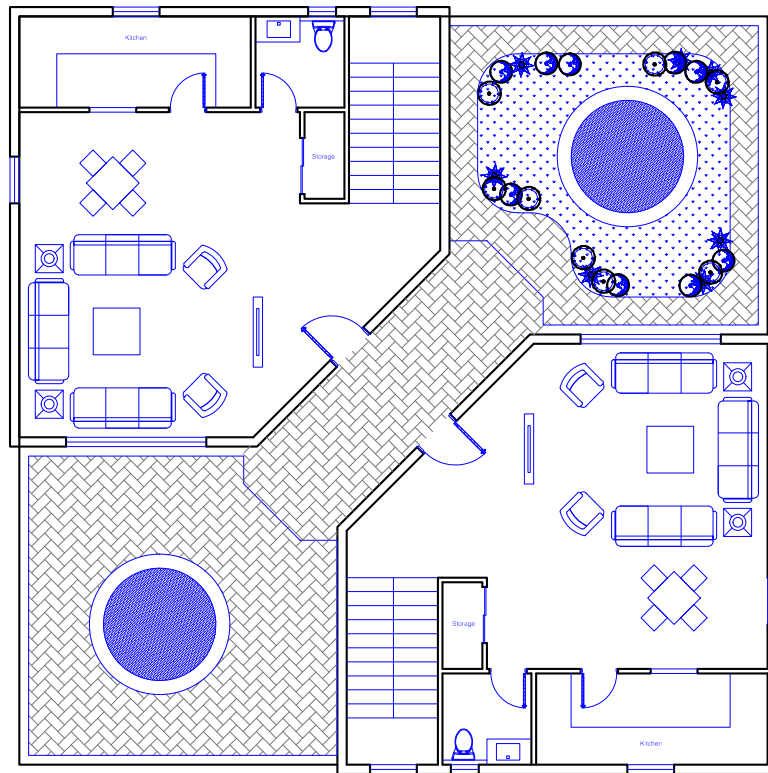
first floor plan with two apartment units with a garden (top), and ground floor plan with terraces.
